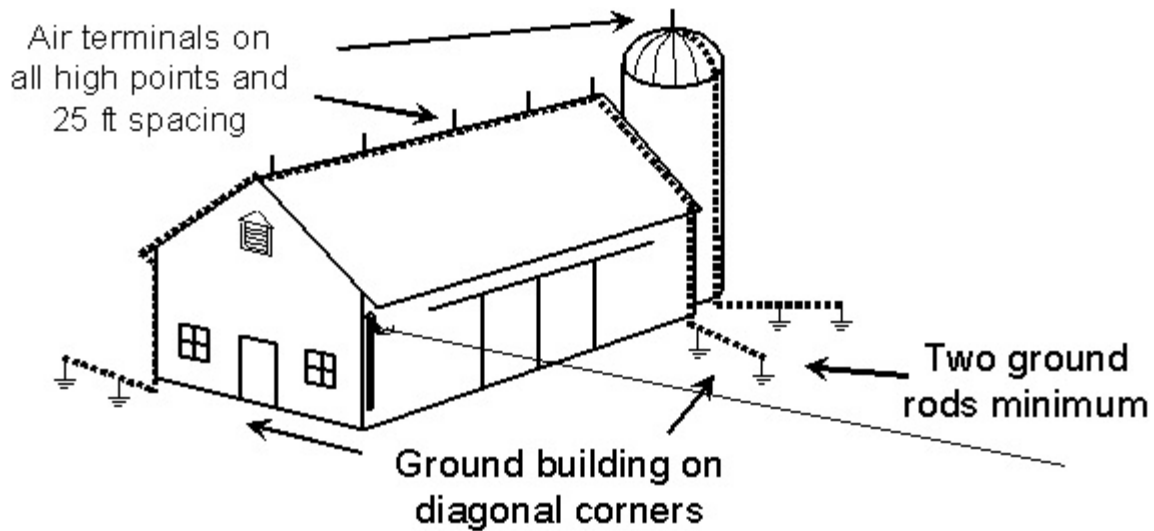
Attach air terminals to the roof ridge and other high points and connect them to grounding electrodes opposite corners of the building with a main connecting wire.
